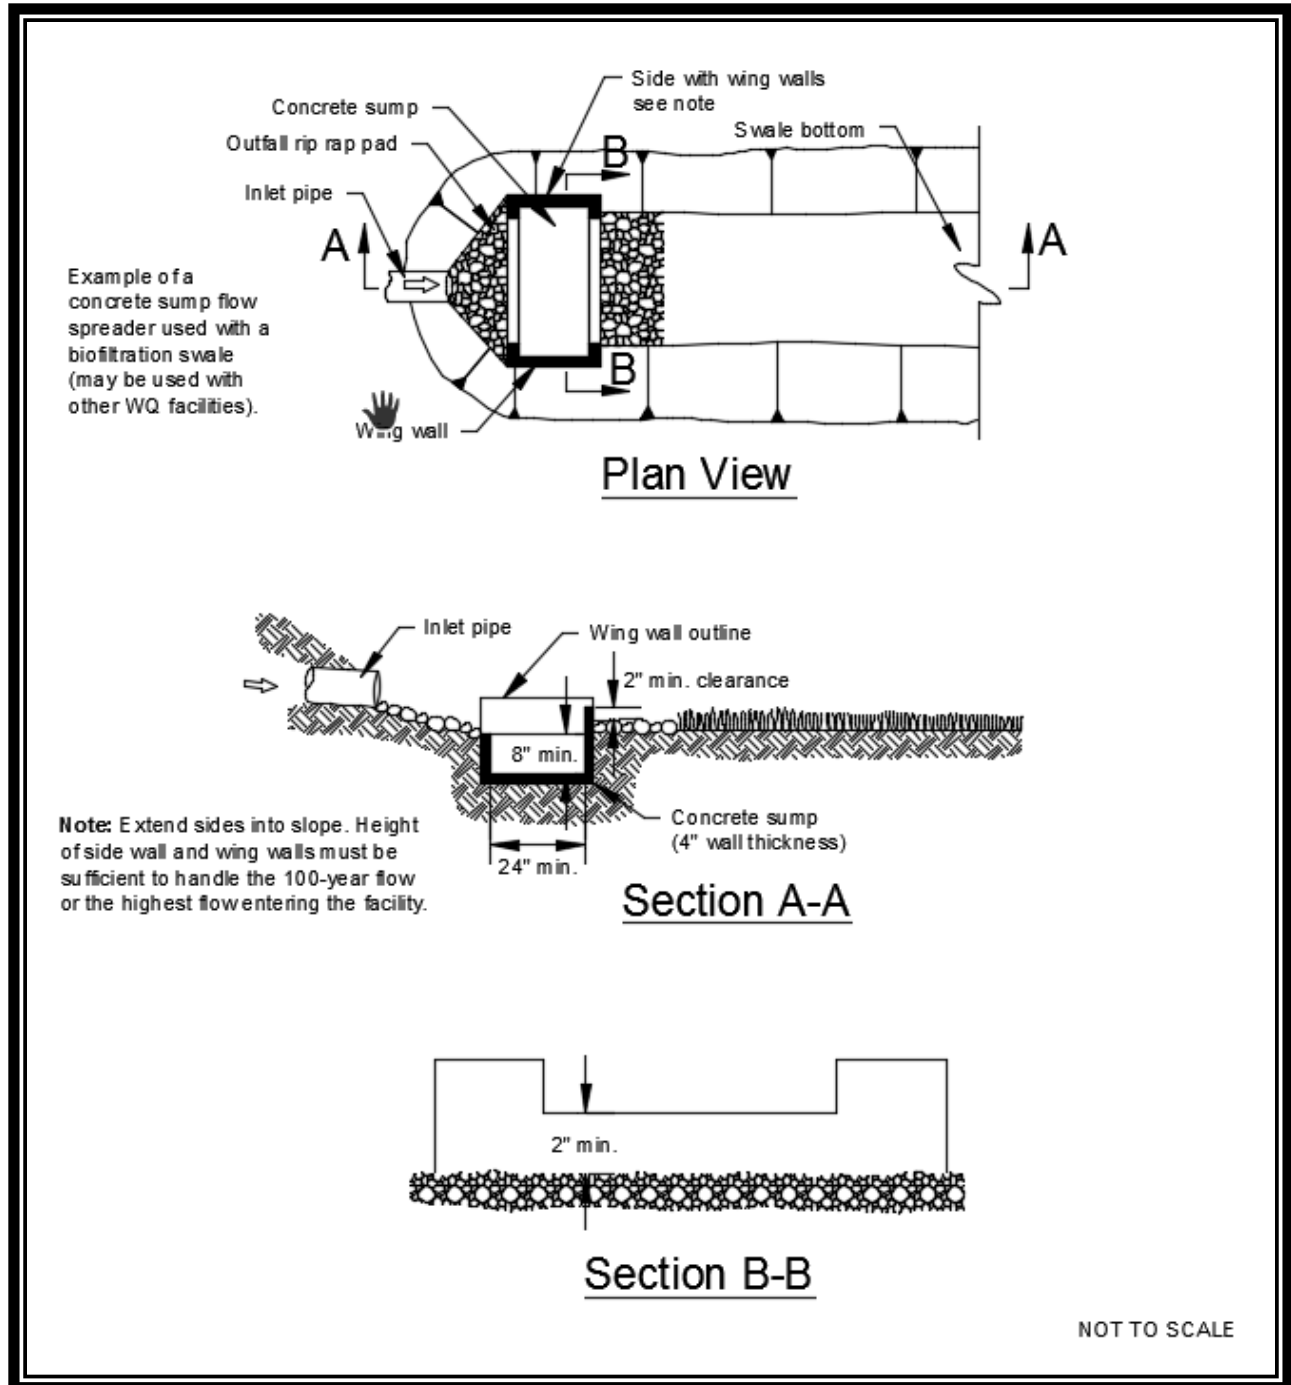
Flow Spreader Option B: Concrete Sump Box (Source: Stormwater Management Manual for Western Washington)
